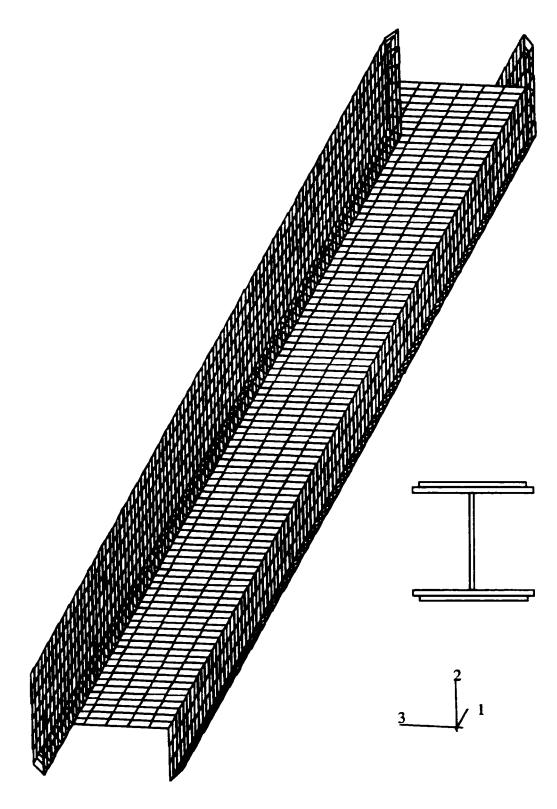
Finite Element Mesh of Column Reinforced with the Plates Parallel to the Flanges
